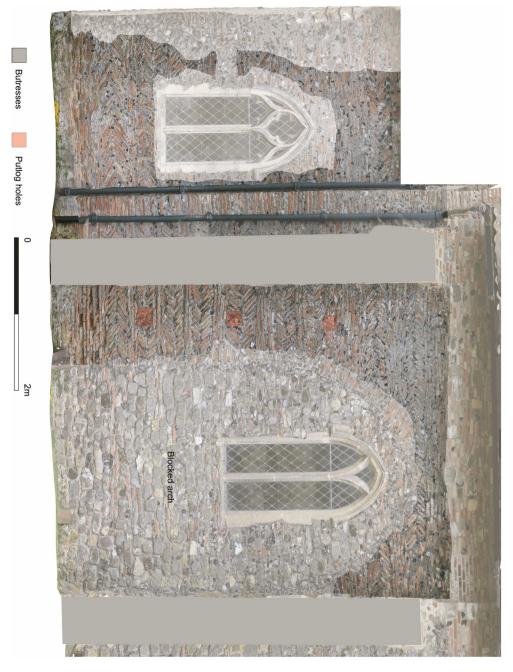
Rectified photography of the brick-built north wall of the nave with the later, blocked arch highlighted.
